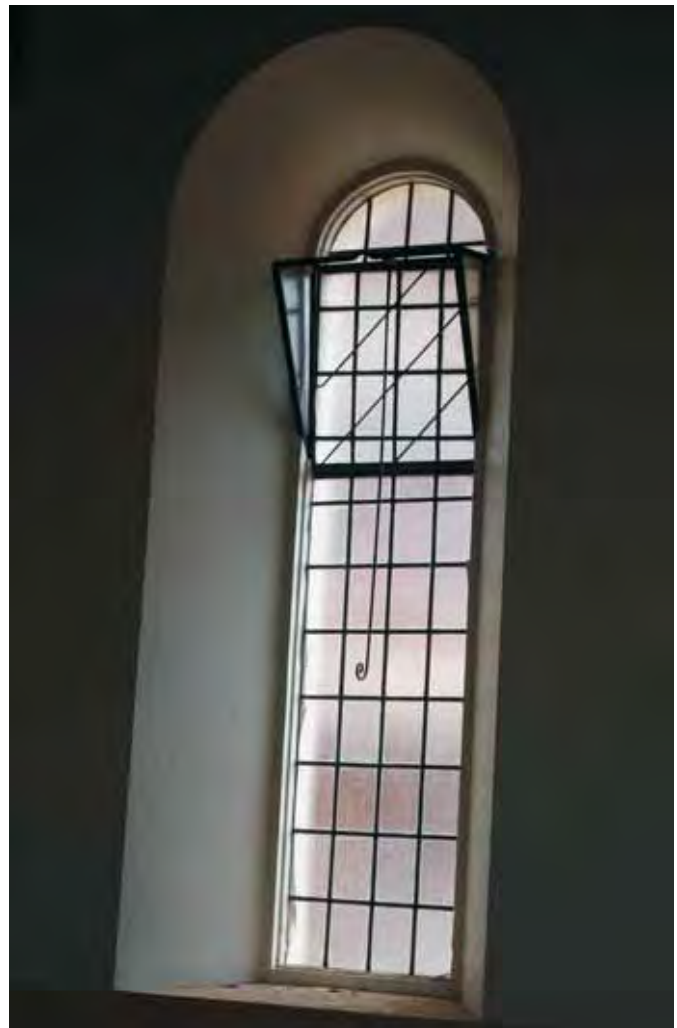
Building 22 – nave: detail of typical plain glazed hopper-light window, view to the southeast
